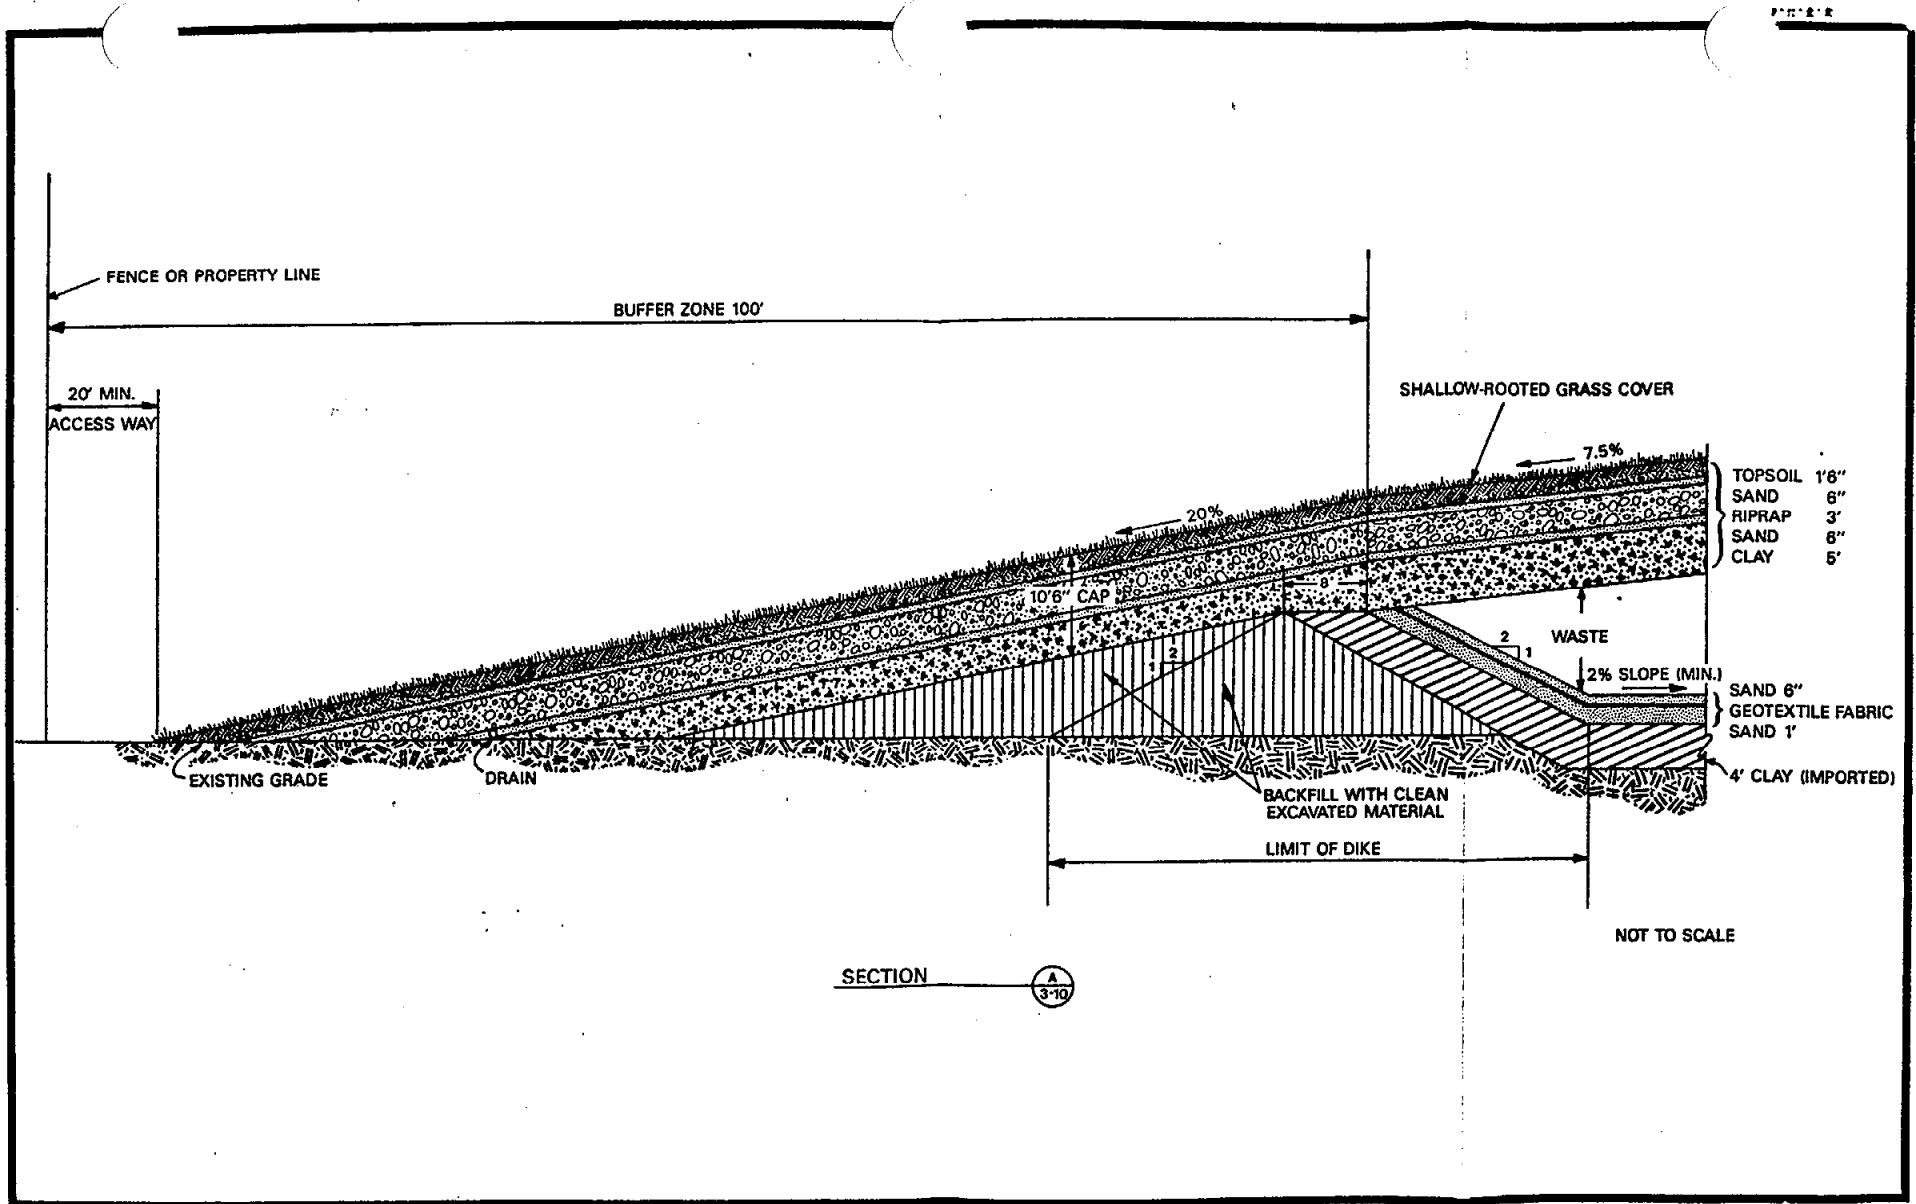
TYPICAL SECTION OF THE MAYWOOD DISPOSAL FACILITY (ALTERNATIVE 2)
